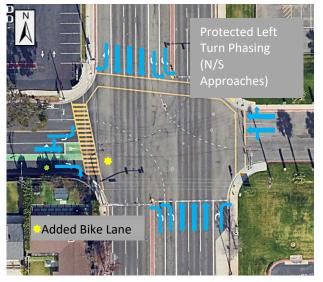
B. Proposed Lane Configuration on Fairview Road/Merrimac Way
